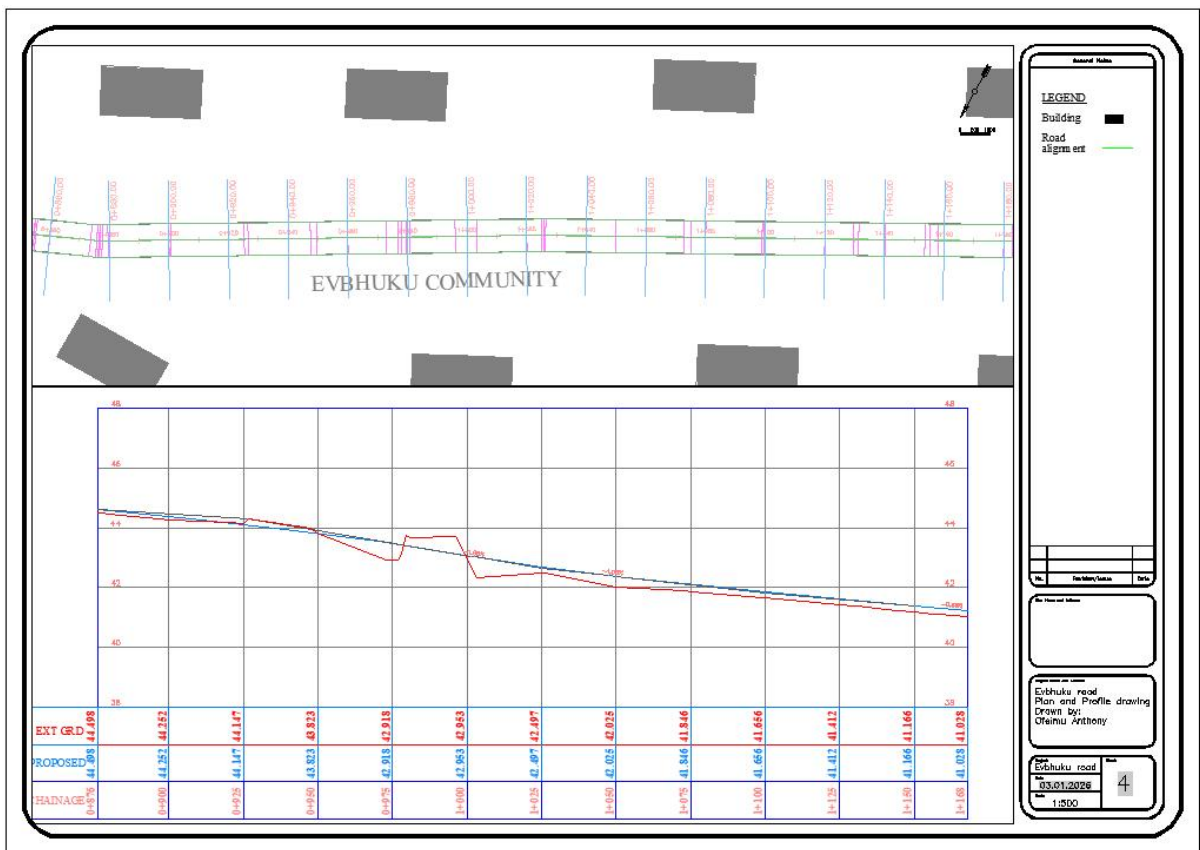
Plan and Profile Drawing (0+876 – 1+168)
